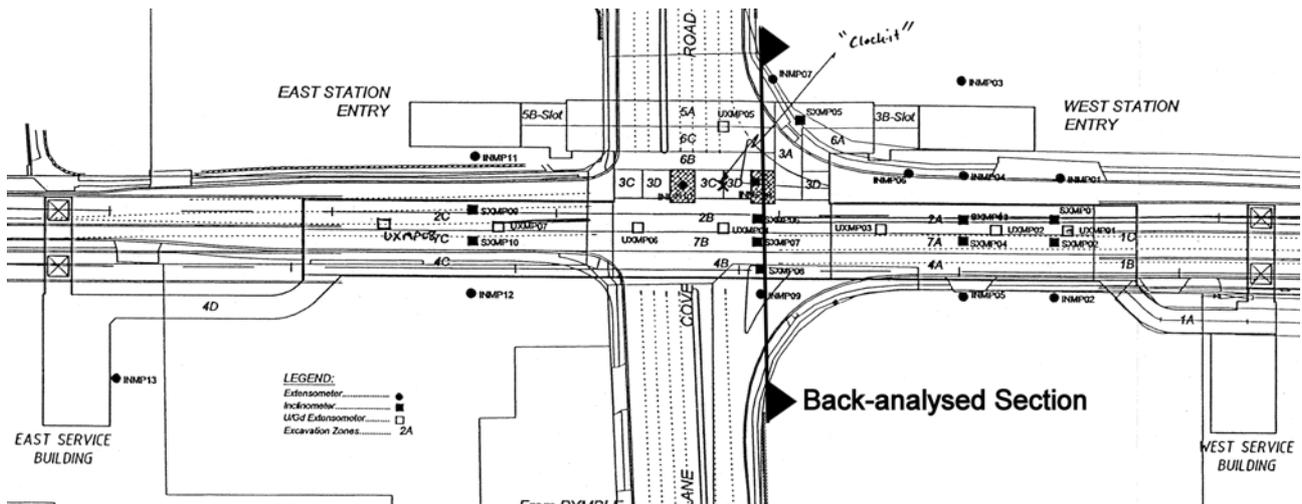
General Layout of Some of Key Instruments Installed at Macquarie Park Station
